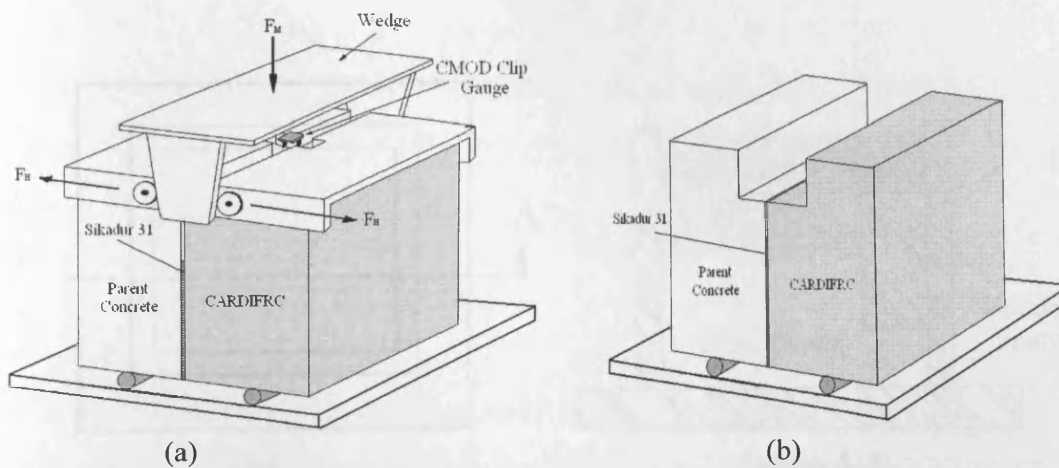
Configuration of bonded specimens: (a) Loading arrangements and (b) wedge splitting specimen of bonded system
